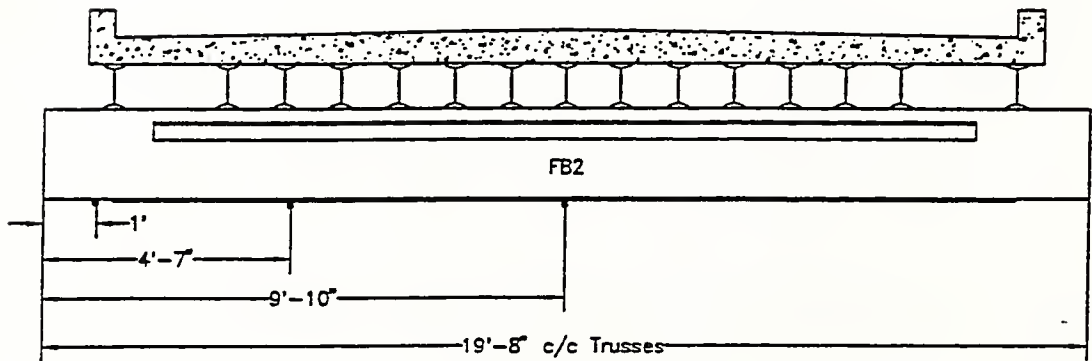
Deck strain gage locations (Plan view)
